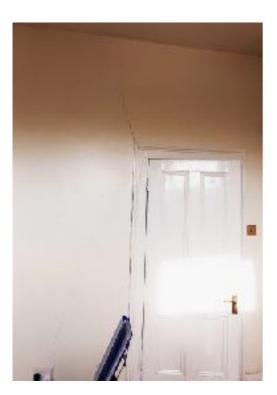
Typical cracks in First Floor party wall and door.
